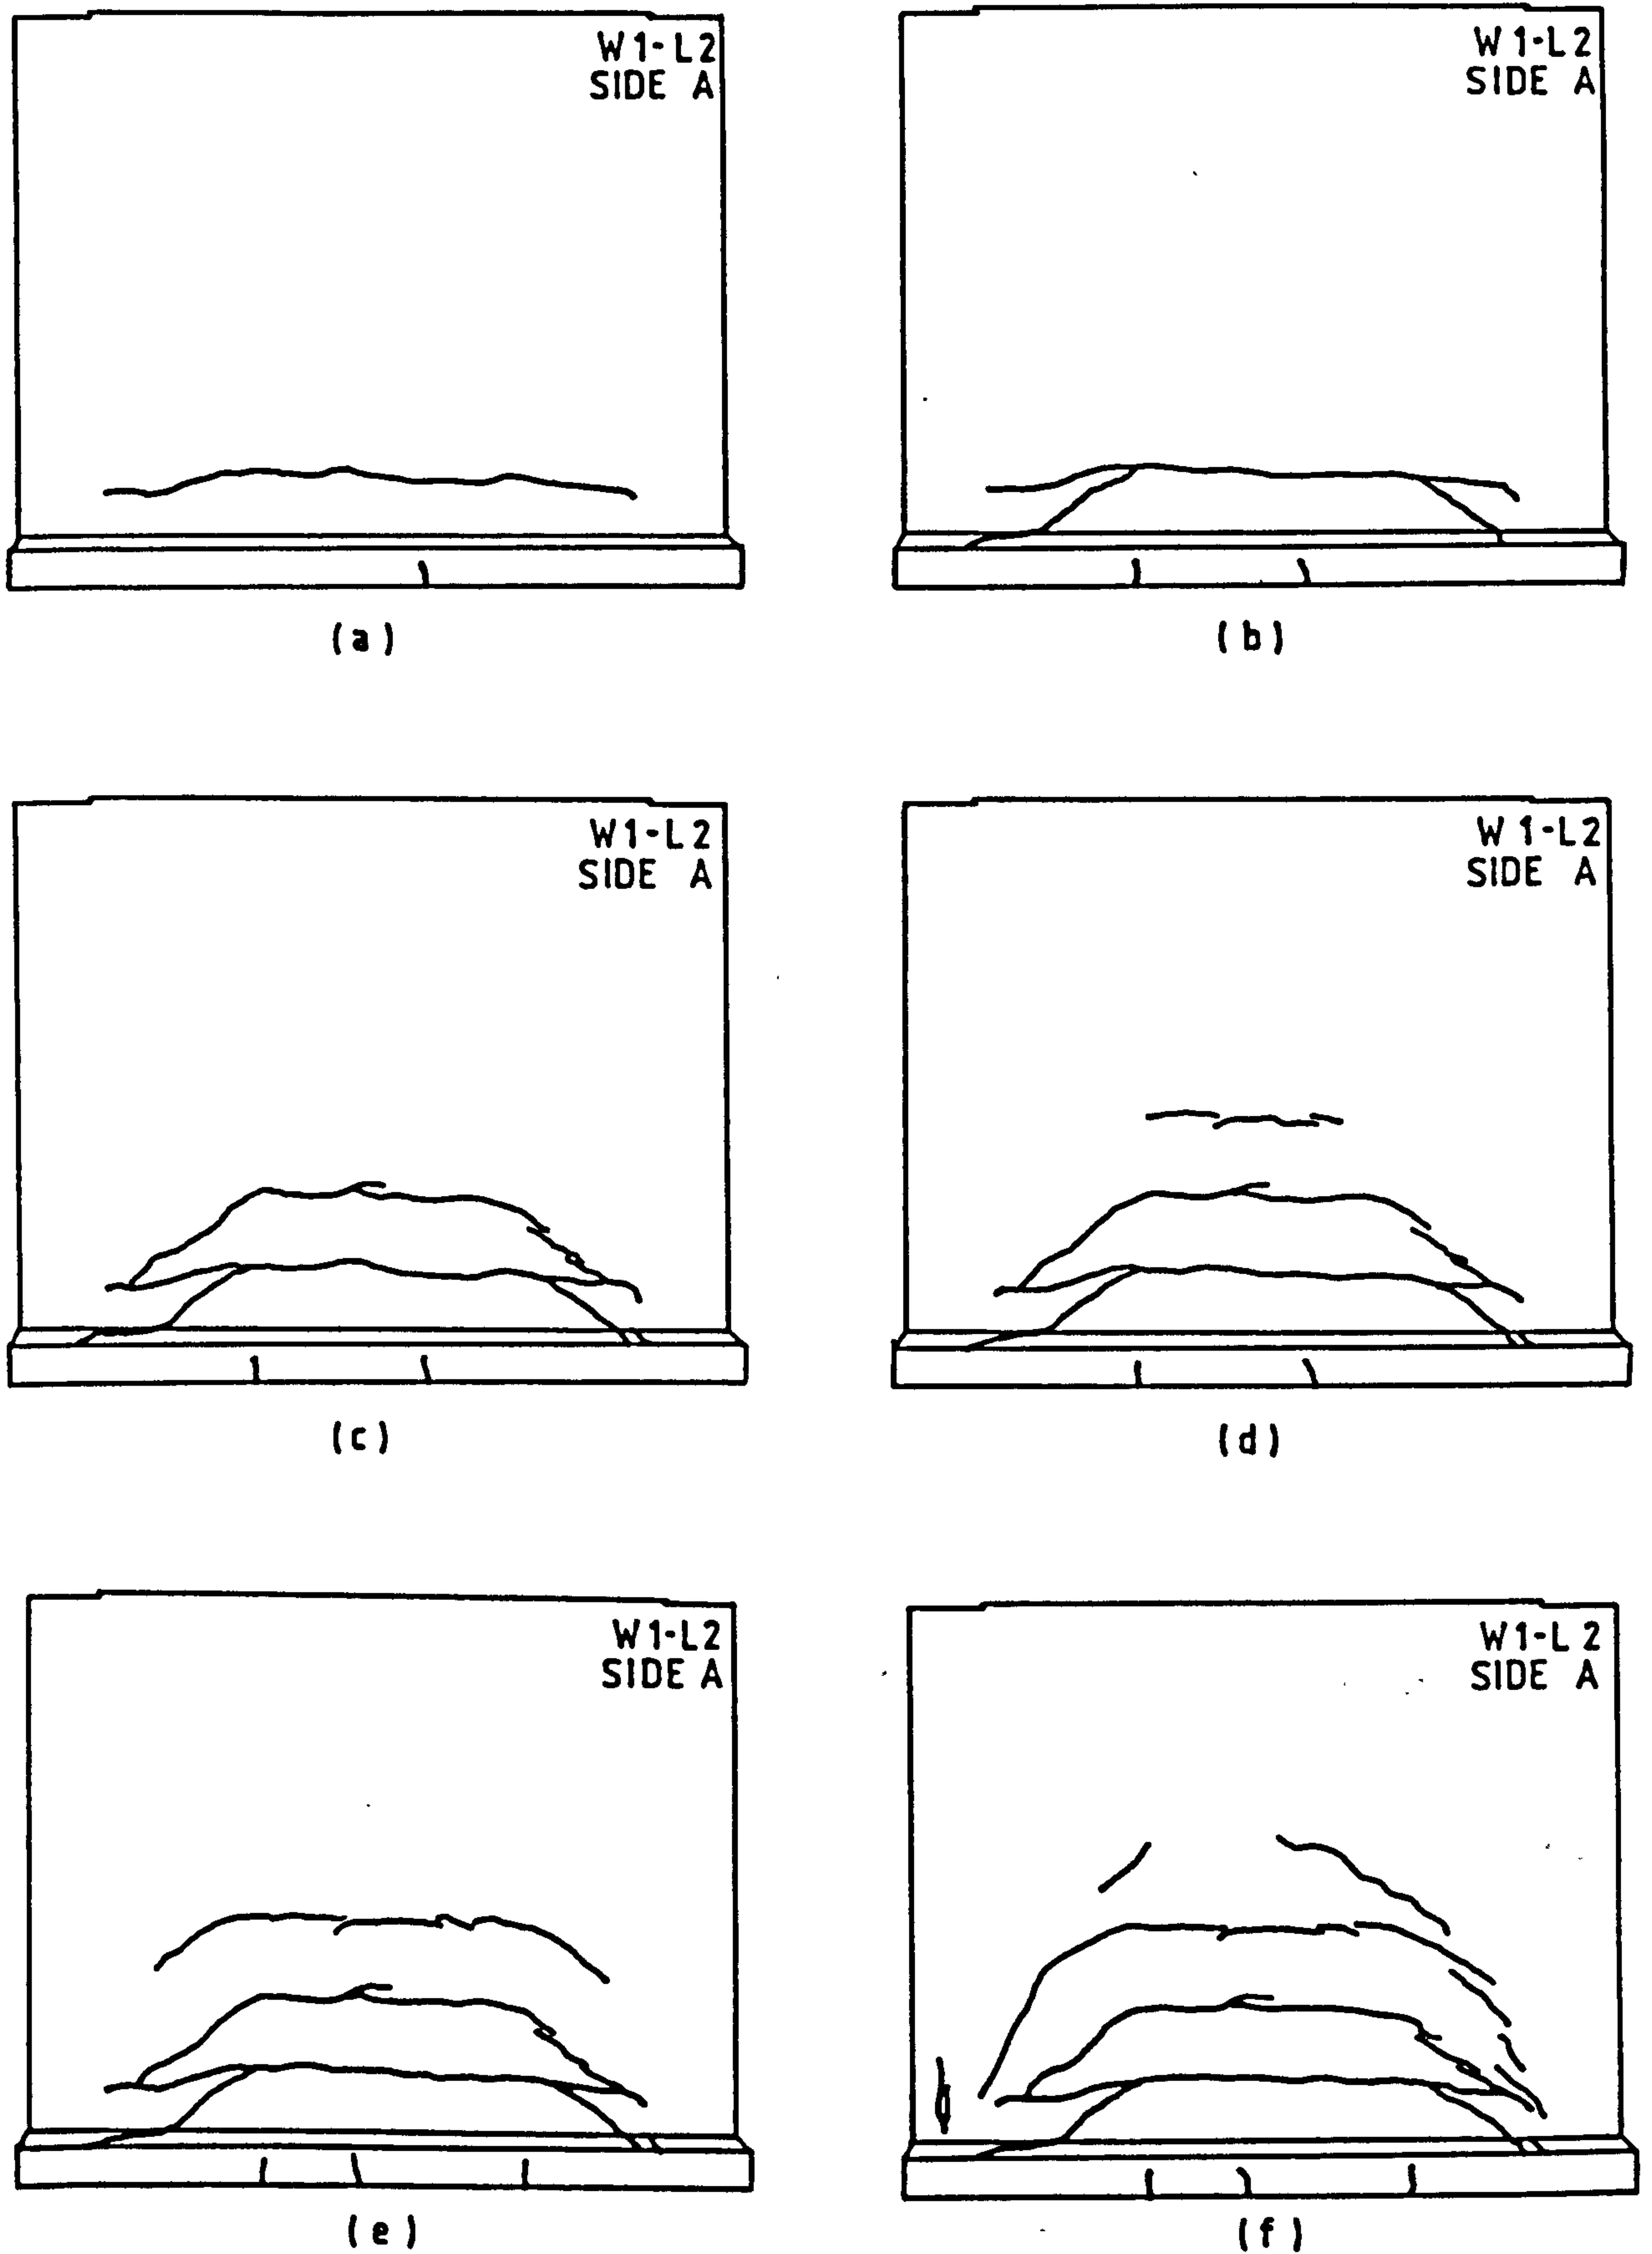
Development of cracks in wall W1-L2
